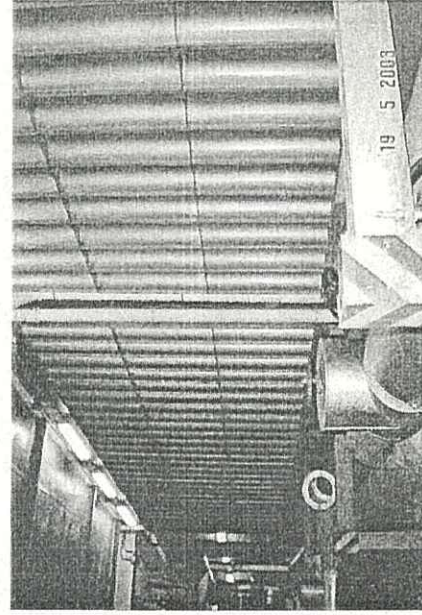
Acoustic Louvers Installed in TIS Chiller Plant Room
